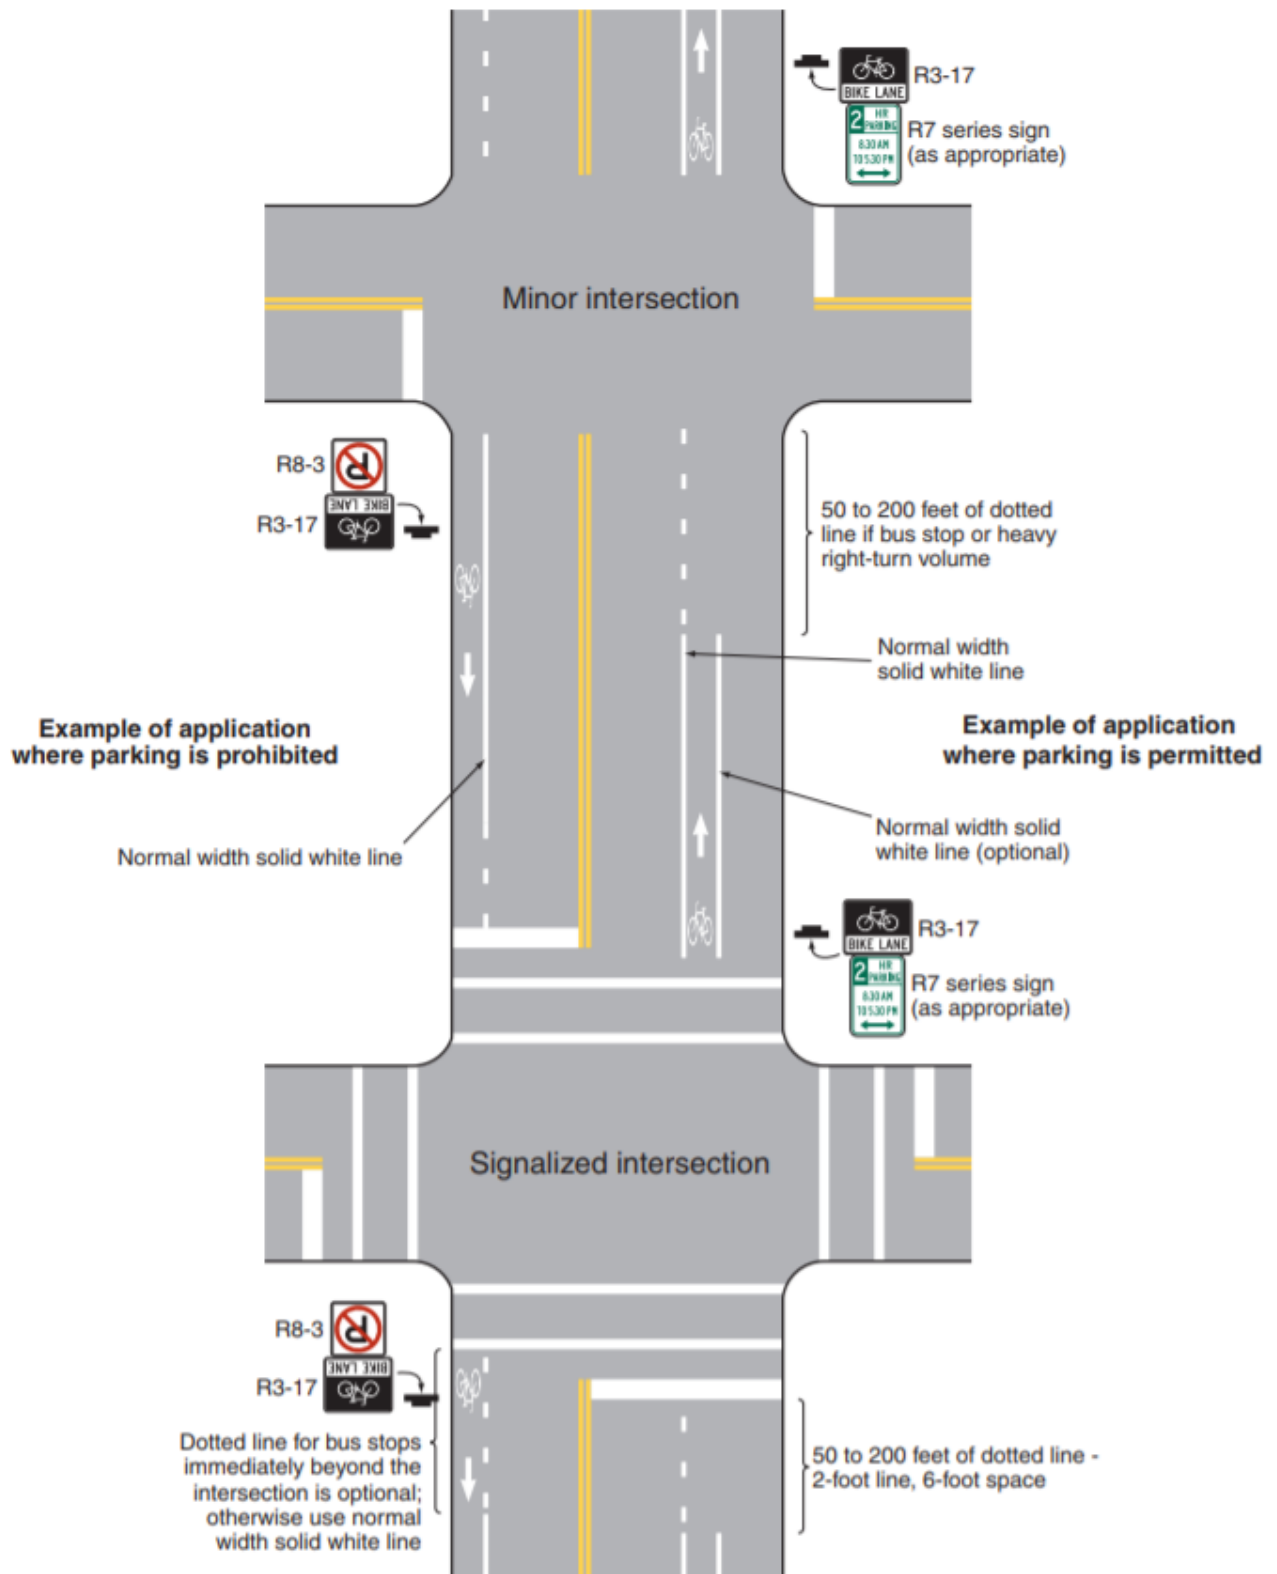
C-6. Example of Pavement Markings for Bicycle Lanes on a Two-Way Street
